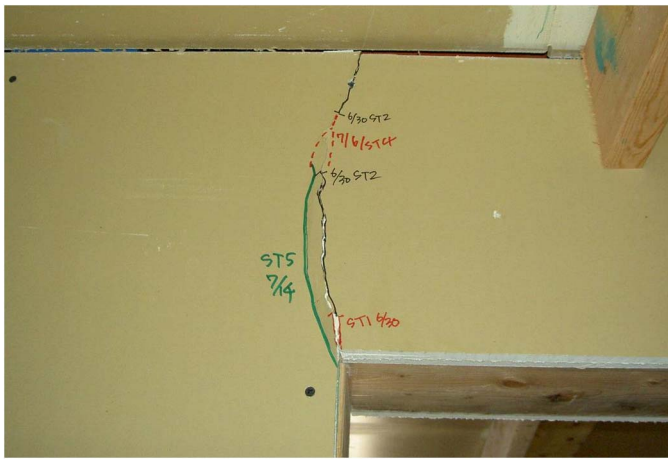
New crack on Wall 2A, Story 7 (over door opening) after Seismic Test 5
